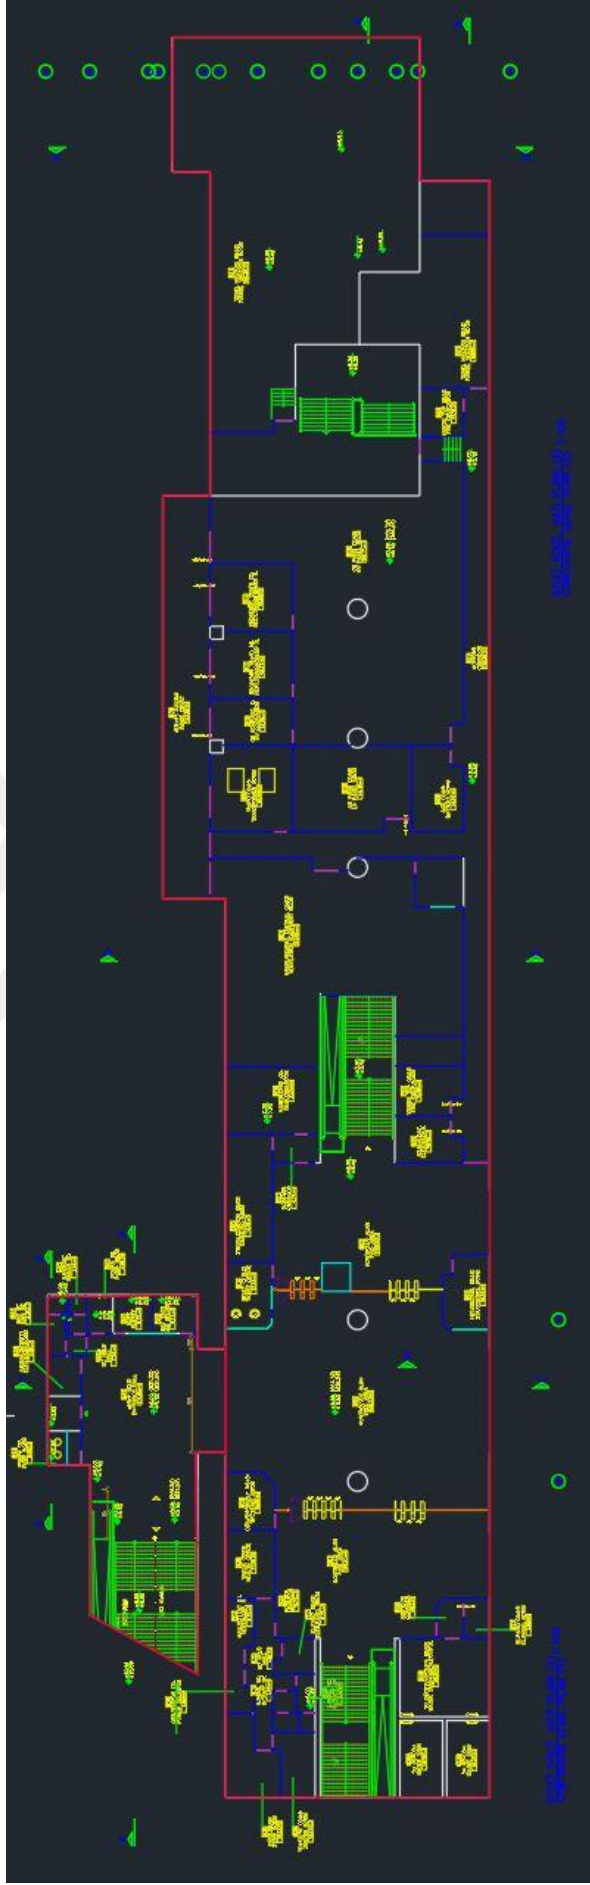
Architectural sketch of Umitkoy metro station ticket hall
